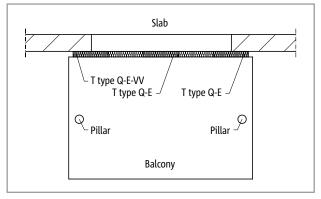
Schöck Isokorb® T type Q-E, Q-E-VV: Balcony with pillar support
